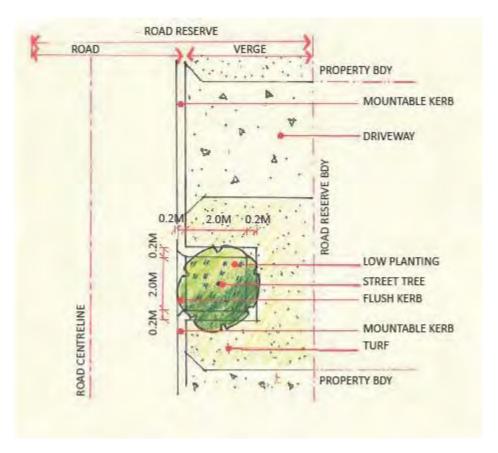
Typical layout plan – no footpath (Scale 1:50@A3)
